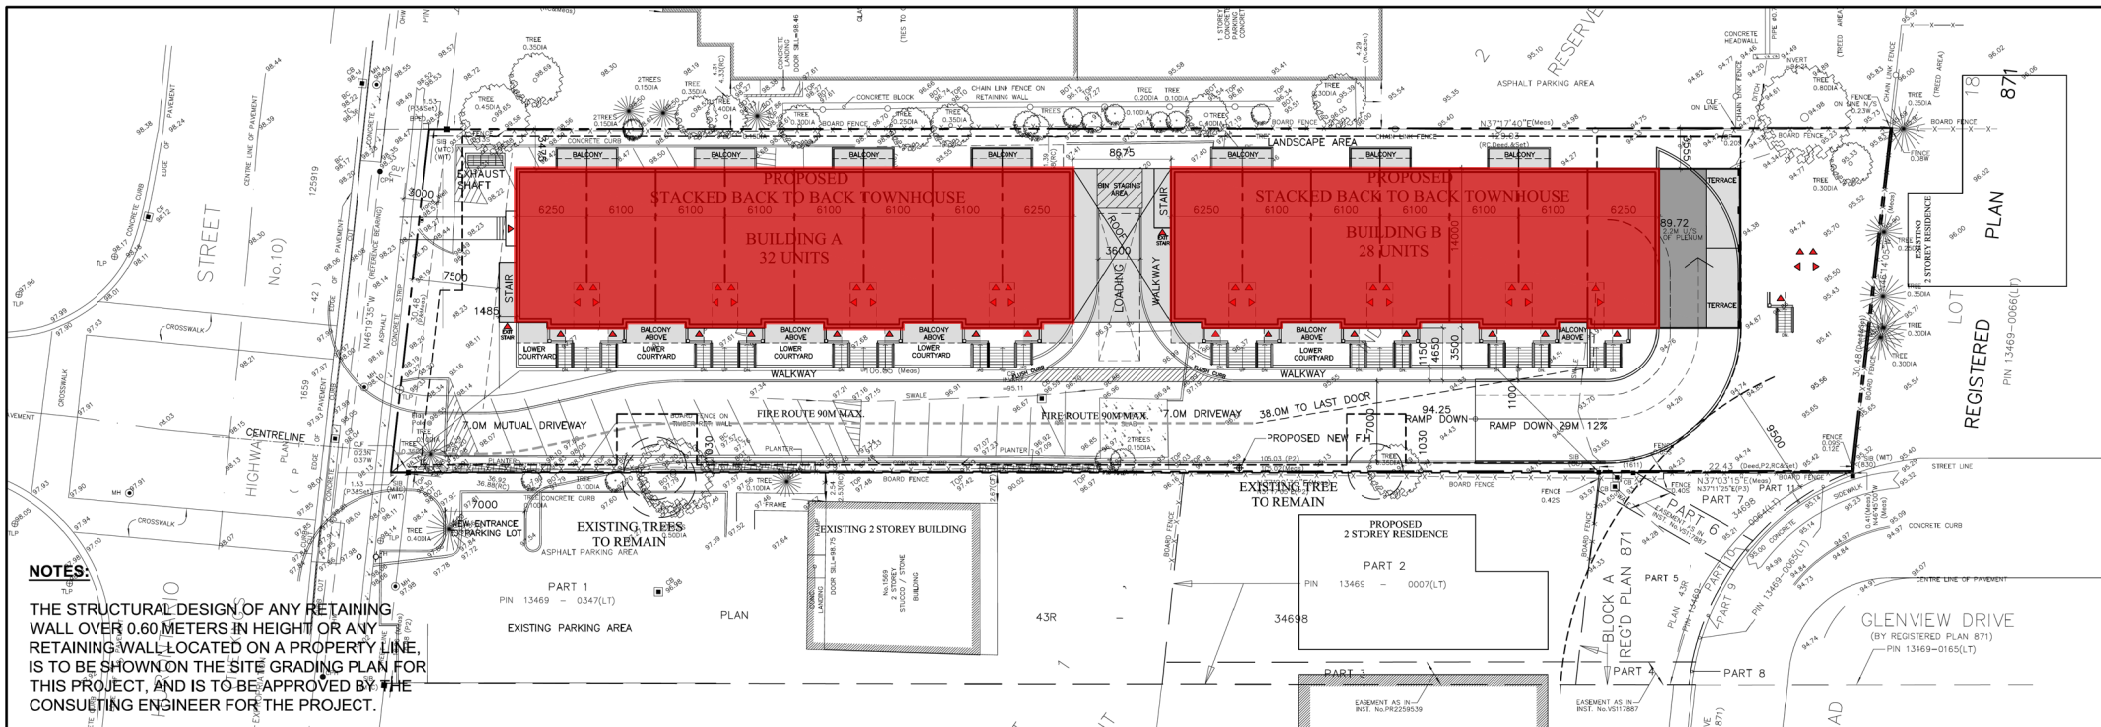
Proposed Site Plan Showing Ventilation Requirements
